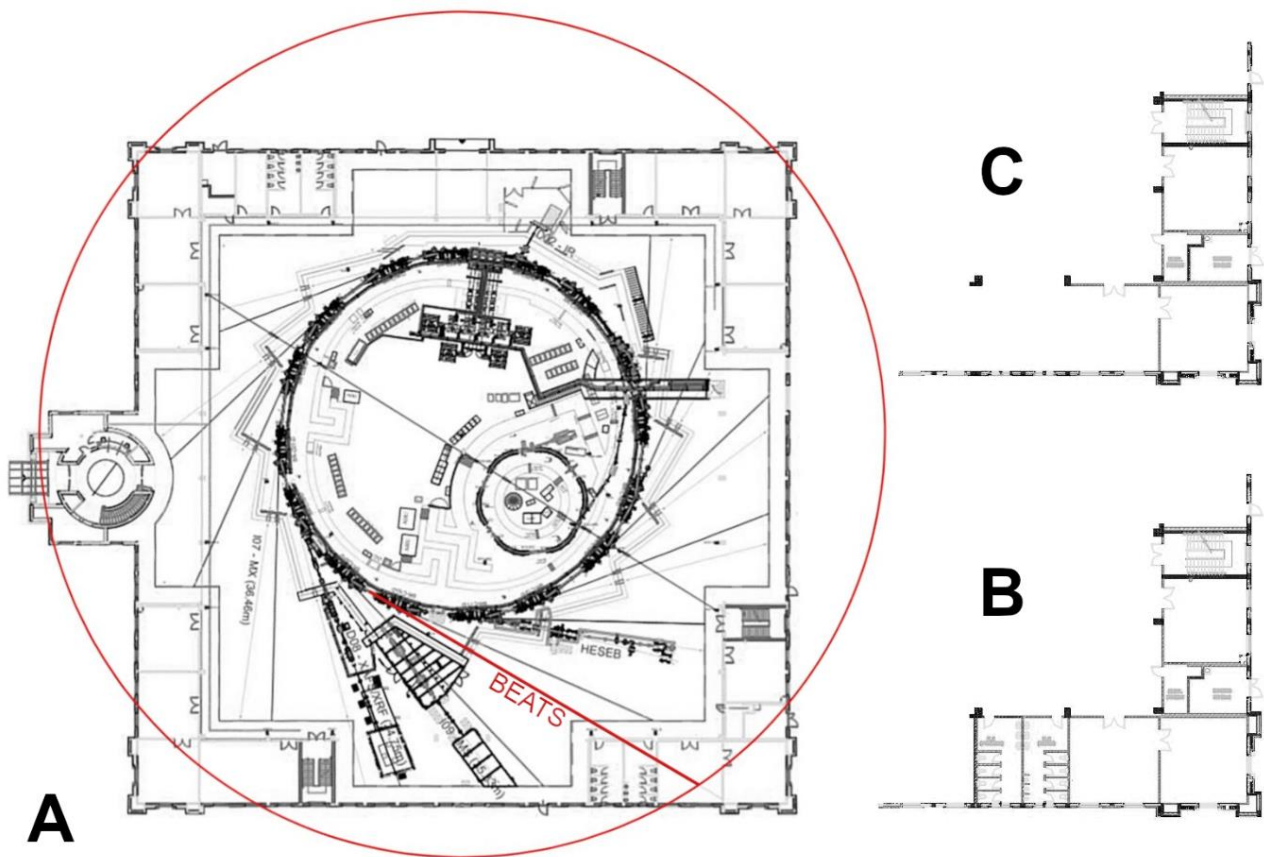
A: Floor plan of the SESAME facility showing the location of BEATS. The red circle indicates the end point of a 45 m long beamline. B: Detail of the current facility floor plan at the location of the BEATS experimental hut (service area). C: Sketch of the modifications to the SESAME service area building required to host the infrastructure of BEATS.
